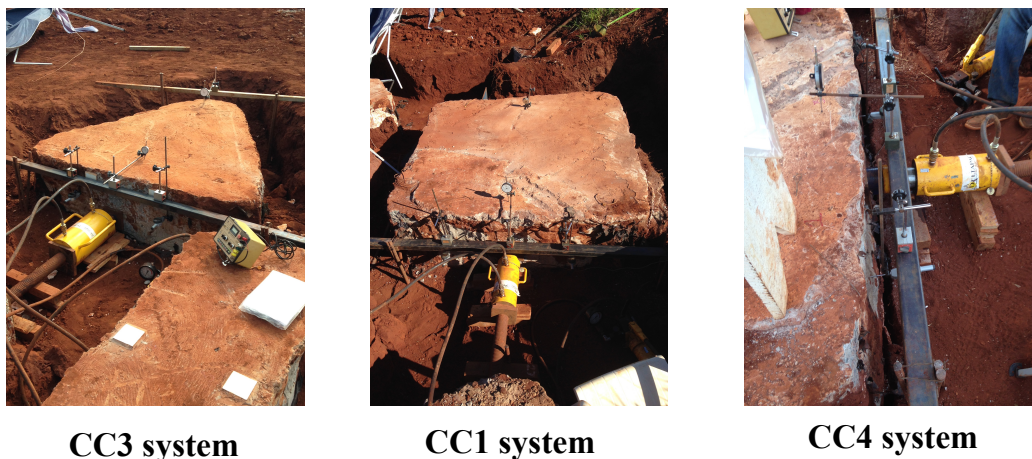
Clear space around the rafts of each of the piled raft systems was provided to place the equipment and to carry out the full-scale horizontal loading tests.
